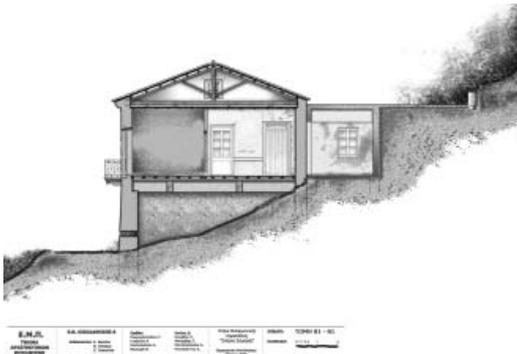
The "Philharmonic Orchestra" building. Section B1-B1.
